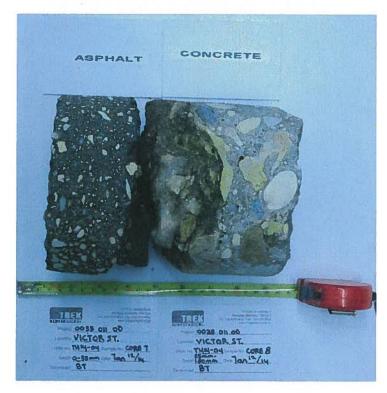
Asphalt and Concrete Core Sample from Test Hole TH14-04
